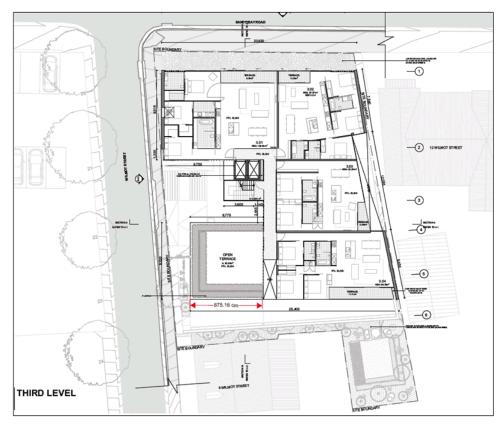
Third level plan, demonstrating the setback of the building from level 3 (source: Room 11 Architects)
